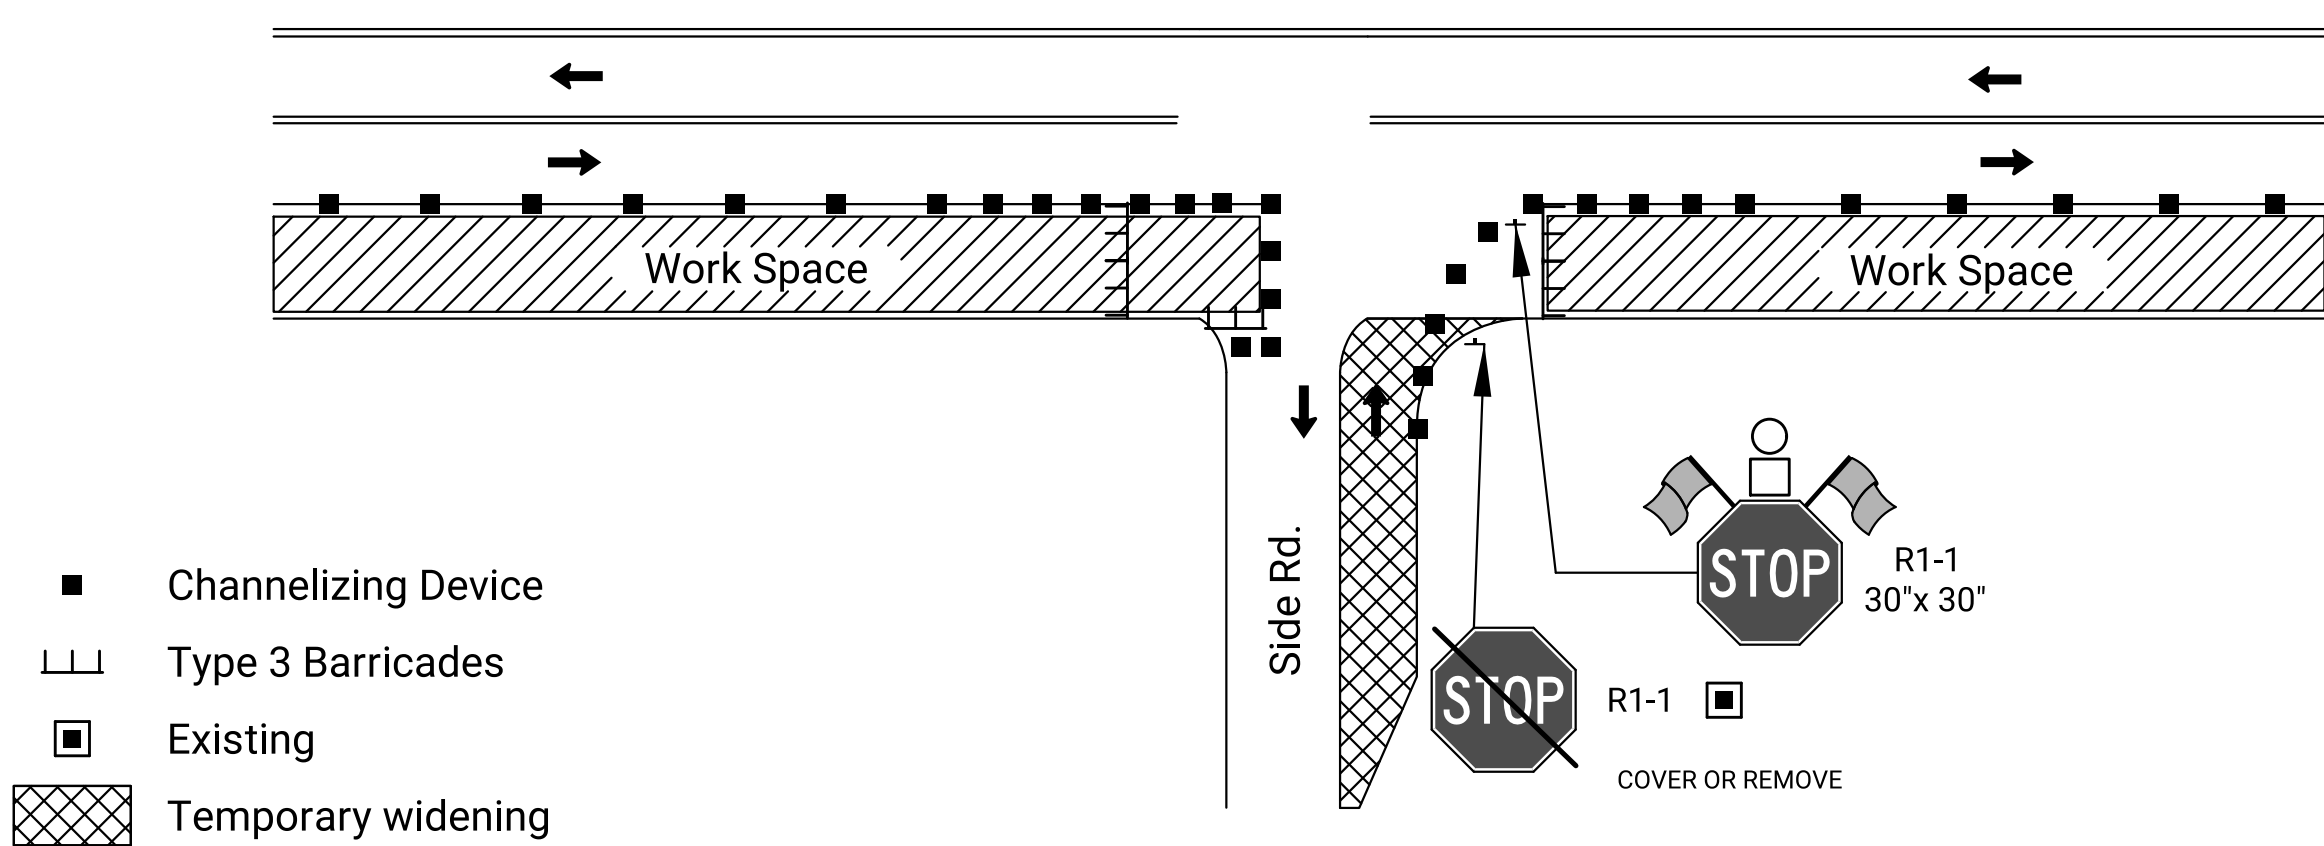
SIDE ROAD OR ENTRANCE CONSTRUCTED HALF AT A TIME:
